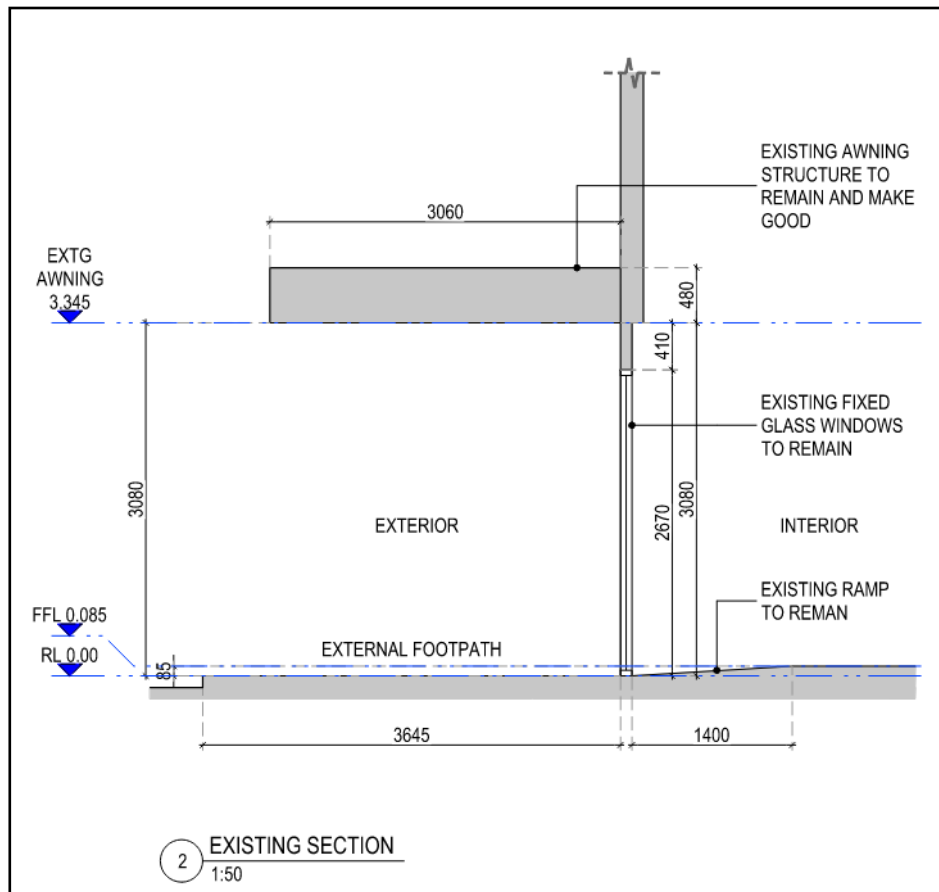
Existing Section of the front of the shop (Source: Yo-Chi)
